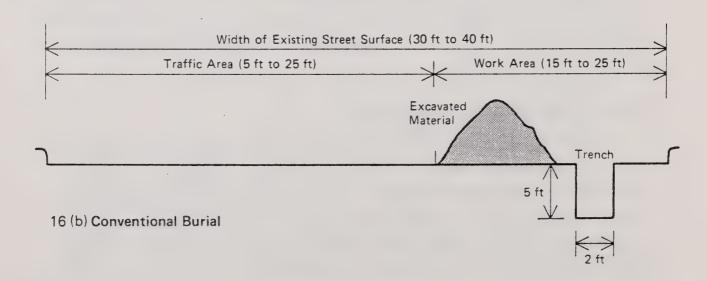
TYPICAL PIPELINE CONSTRUCTION CROSS SECTION
